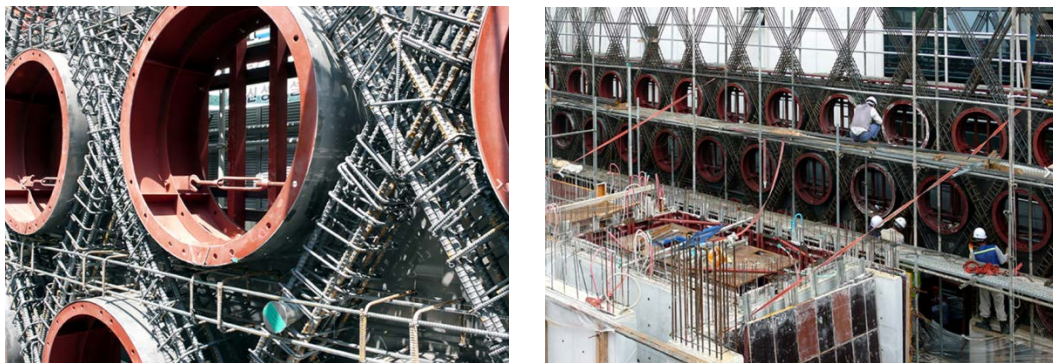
The detailed reinforcement of the exterior concrete wall of Urban Hive Building
